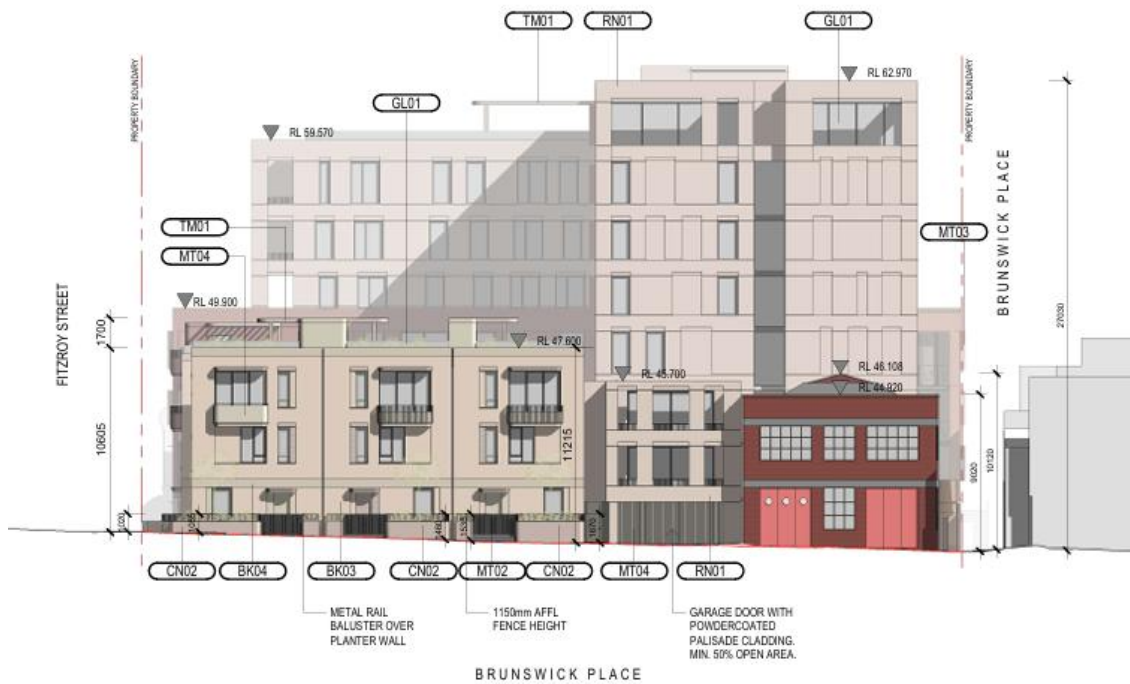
South elevation (Brunswick Place (south)) – Source: Application
